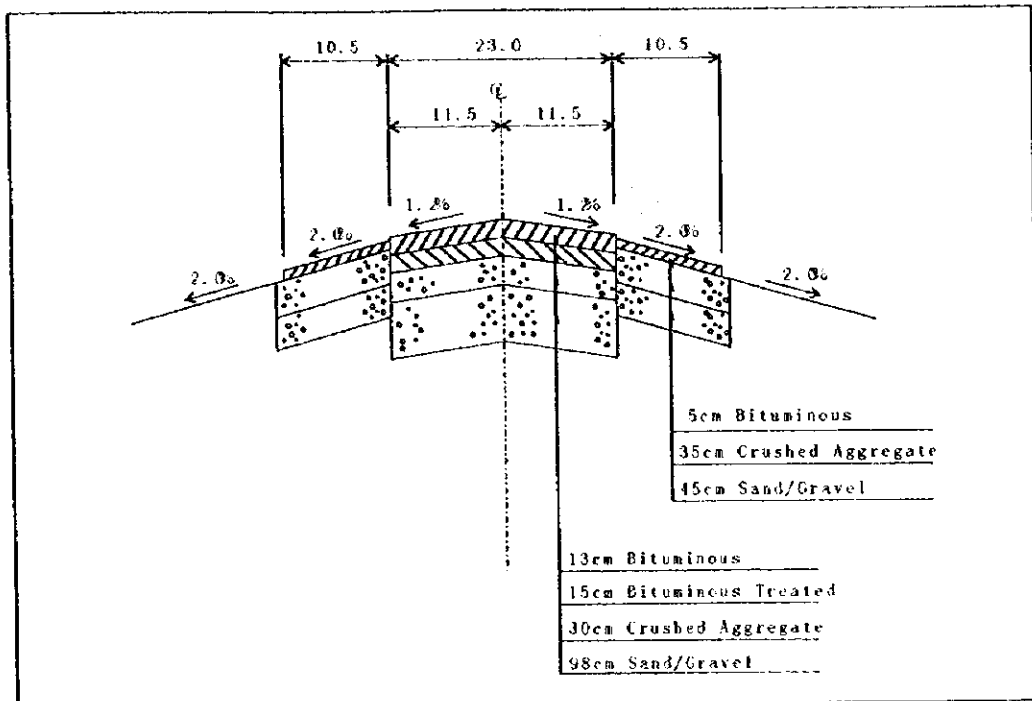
(2) Taxiway Typical Cross Section
